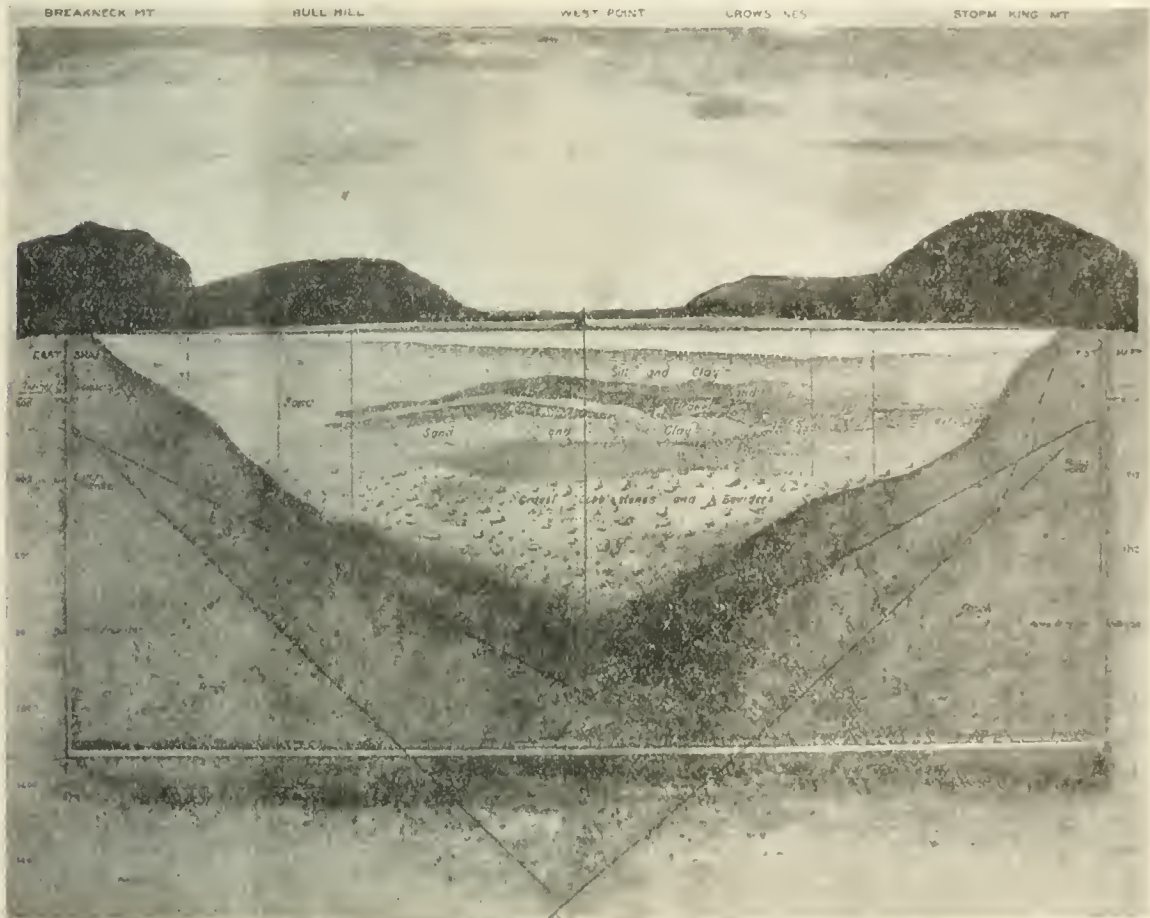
CROSS-SECTION OF HUDSON RIVER AT CATSKILL AQUEDUCT TUNNEL CROSSING, SHOWING DIAMOND DRILL EXPLORATION HOLES.
